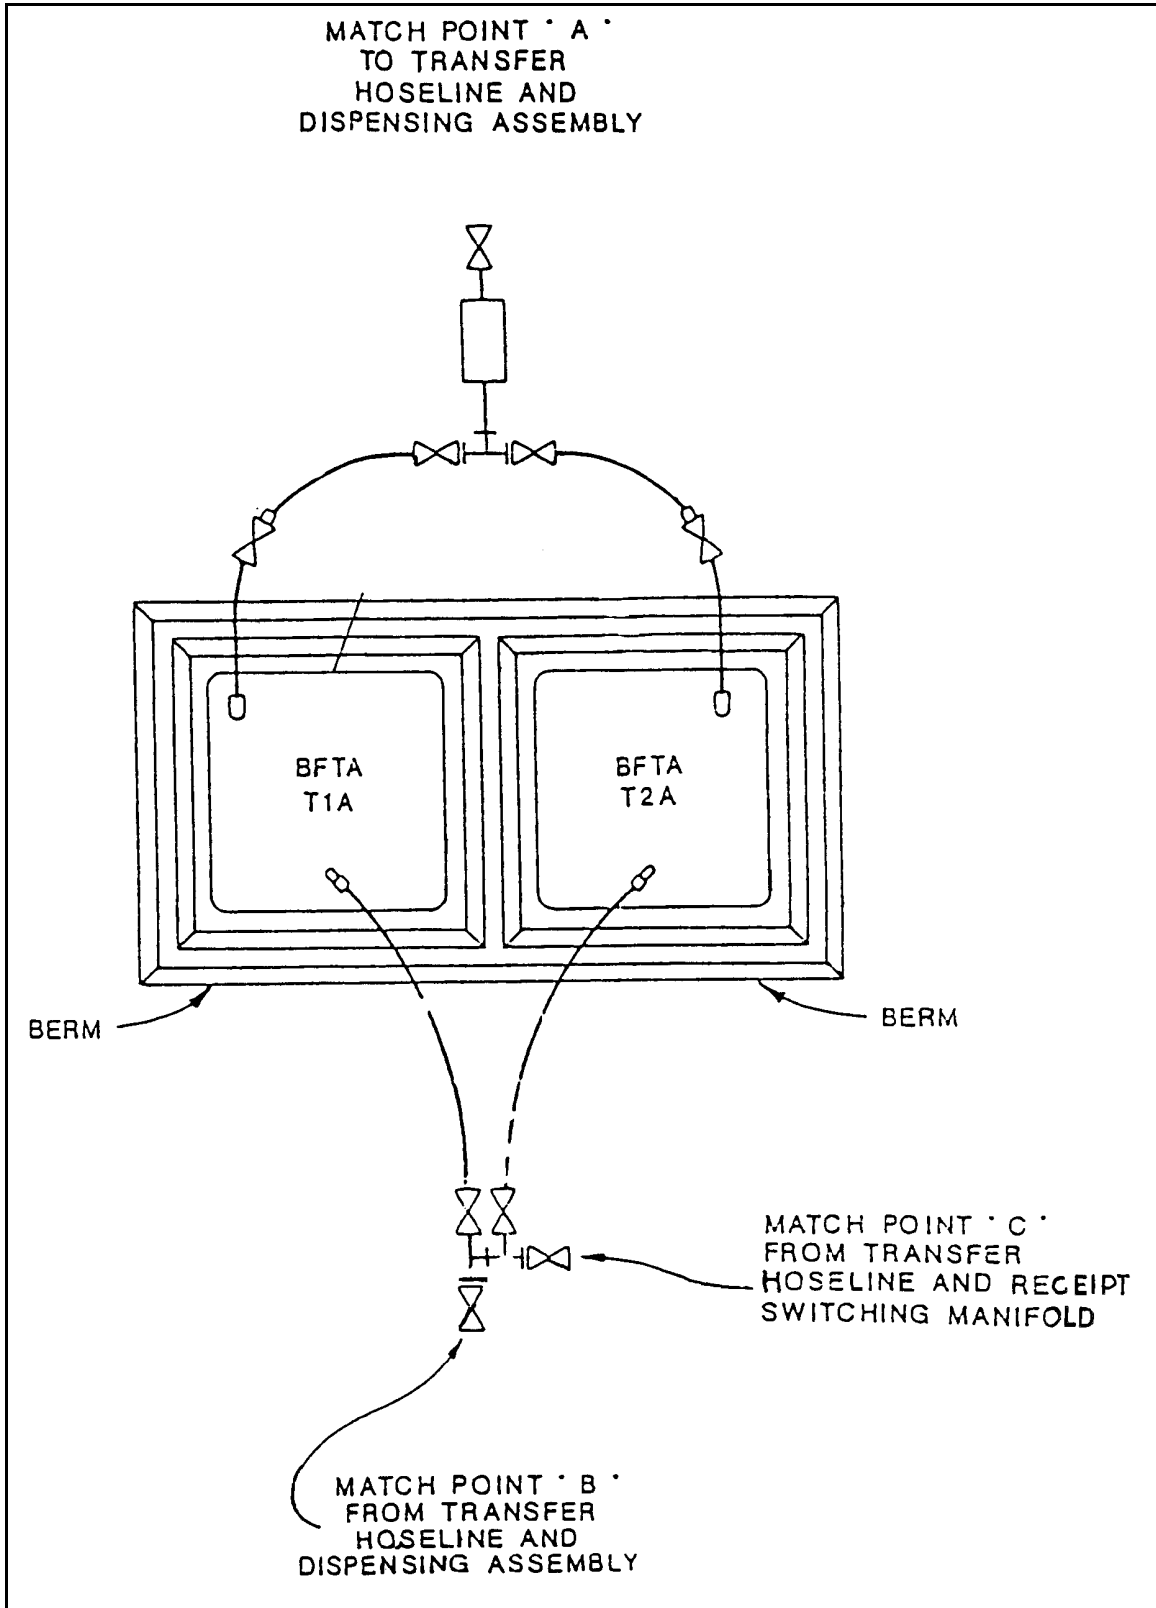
Tank farm (Module) assembly layout, typical layout with separate berm construction, hose, valve, and fitting installation
